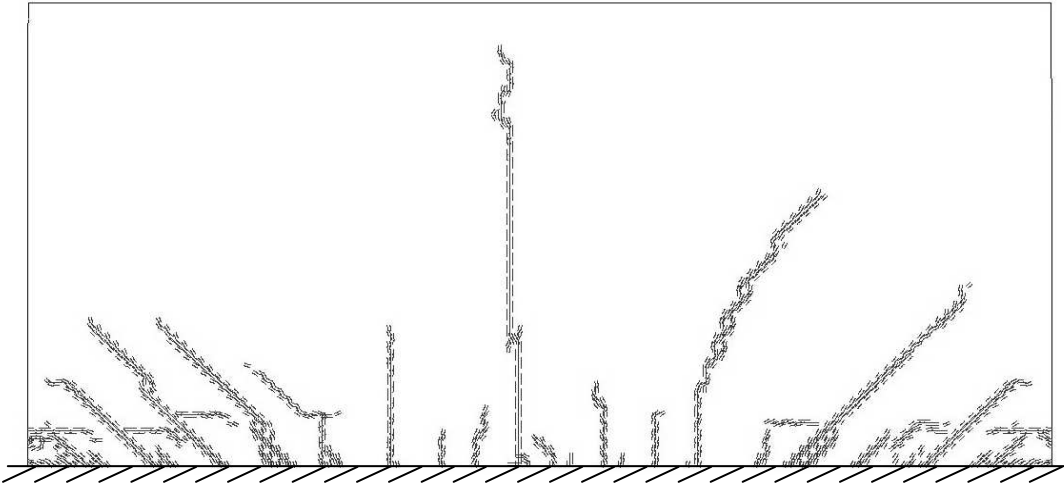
Crack pattern for wall with Cross-section 0, plain concrete.
